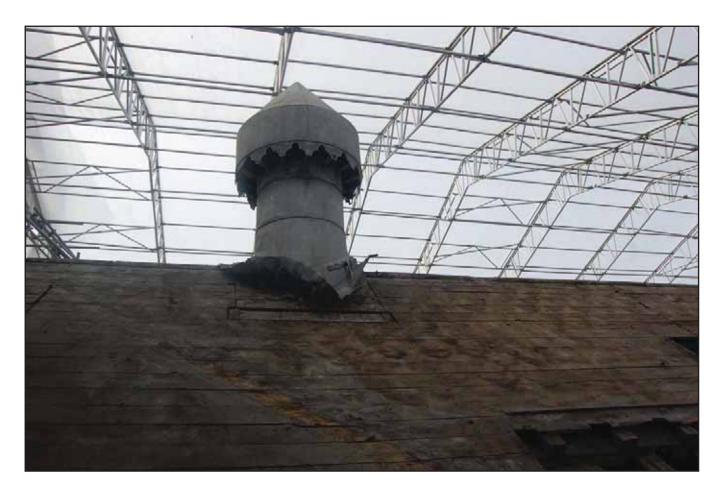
Old Grammar School External- view east of roof during renovation: cupola detail
